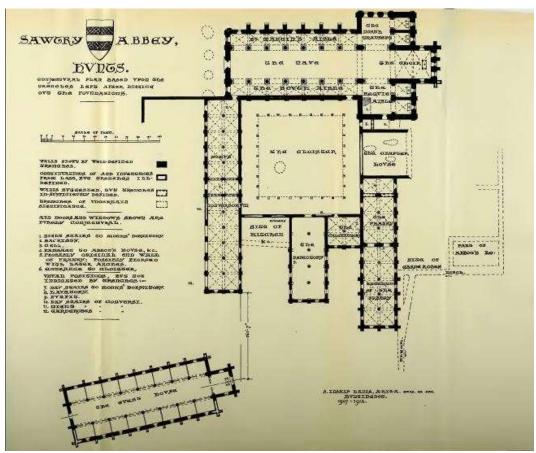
Abbey plan (Inskip Ladds, 1913)
